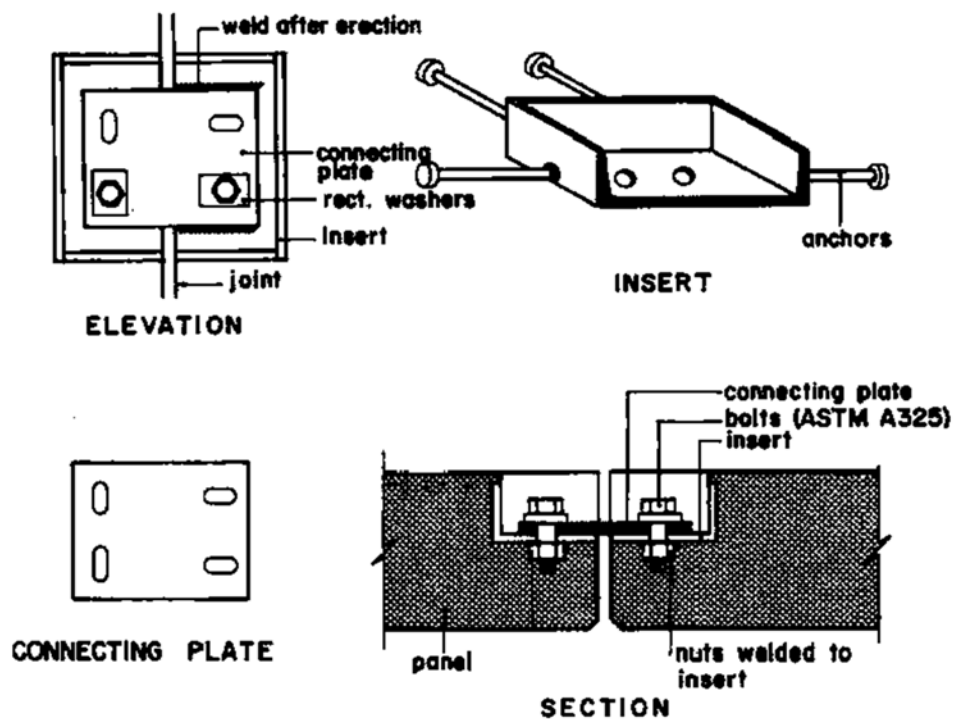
Typical details of LSB bolted connections: Simple wall-wall joint (Pall et al., 1980)
